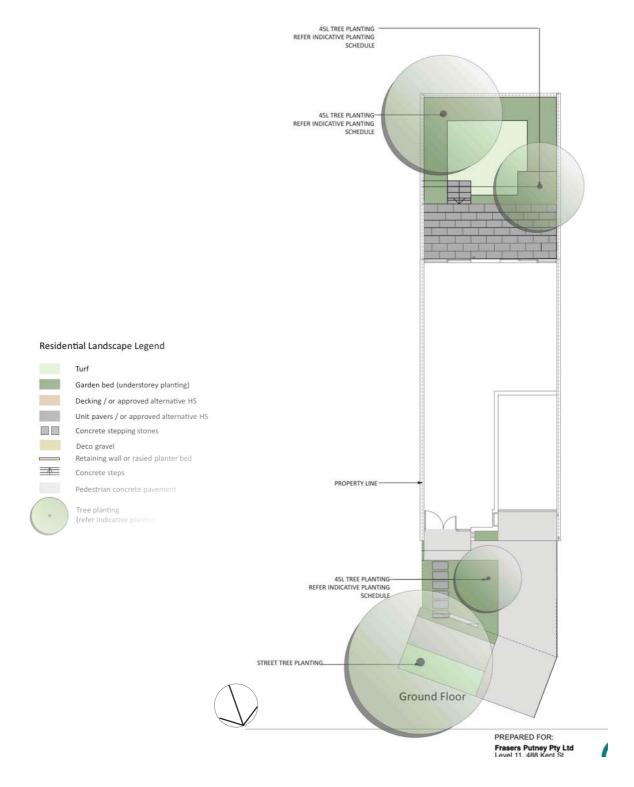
Typical House Type Five (Terrace) landscape concept plan
